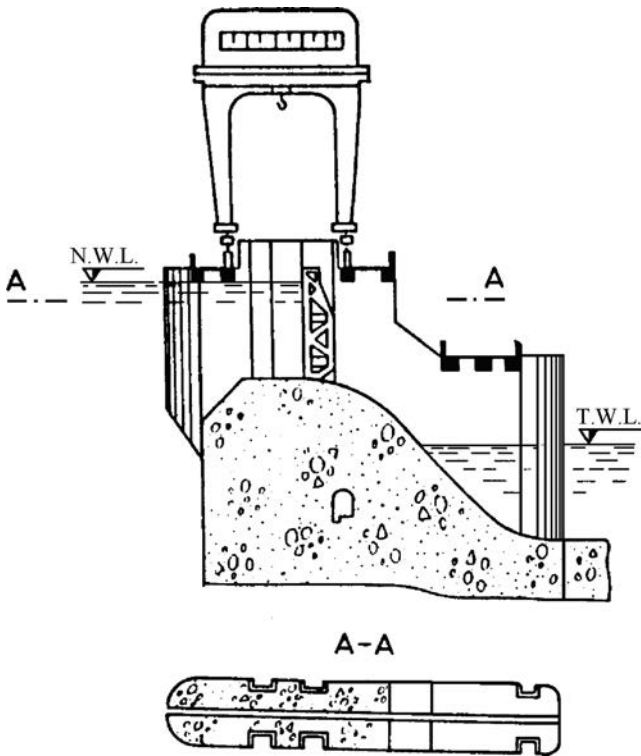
Longitudinal section and a plan of a training wall with a joint.
